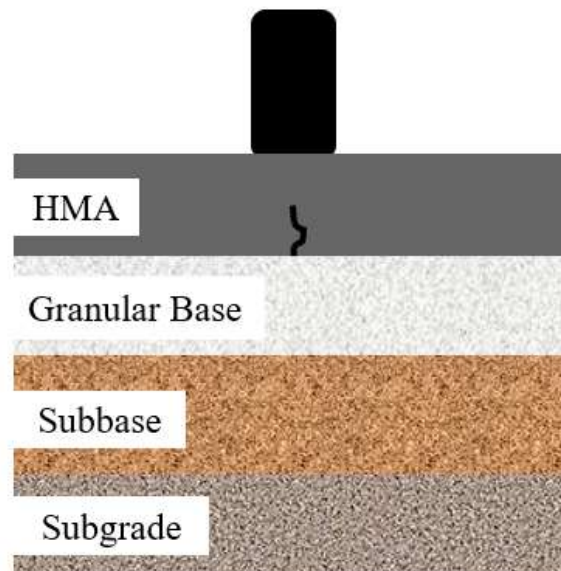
Bottom-Up Cracking in HMA Pavement
